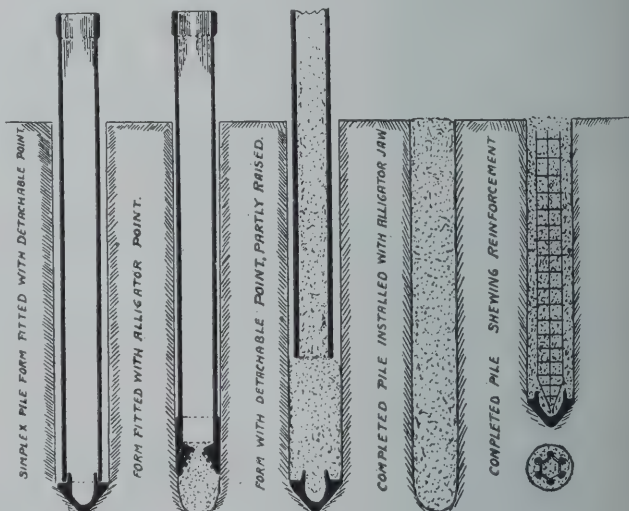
TYPES OF SIMPLEX CONCRETE PILES.
